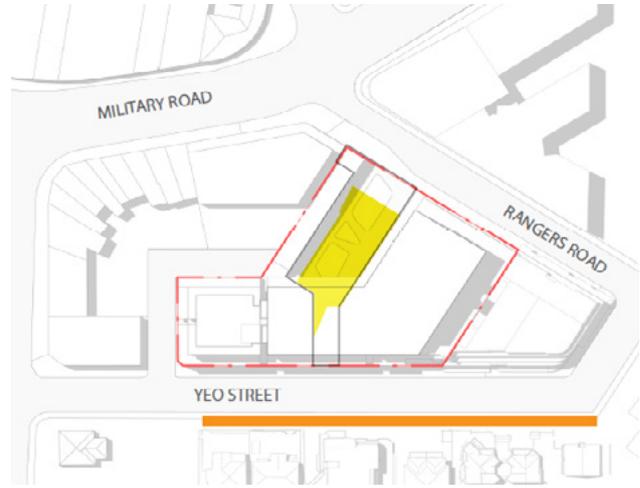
Yeo St PP, Proposed public benefits (source: Woolworths Planning Proposal)
